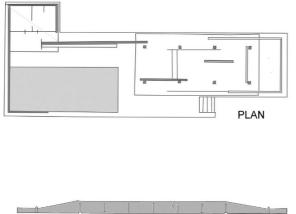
Plan and section of Barcelona Pavilion (drawn with the help of URL9, 2003 and URL10, 2011)
